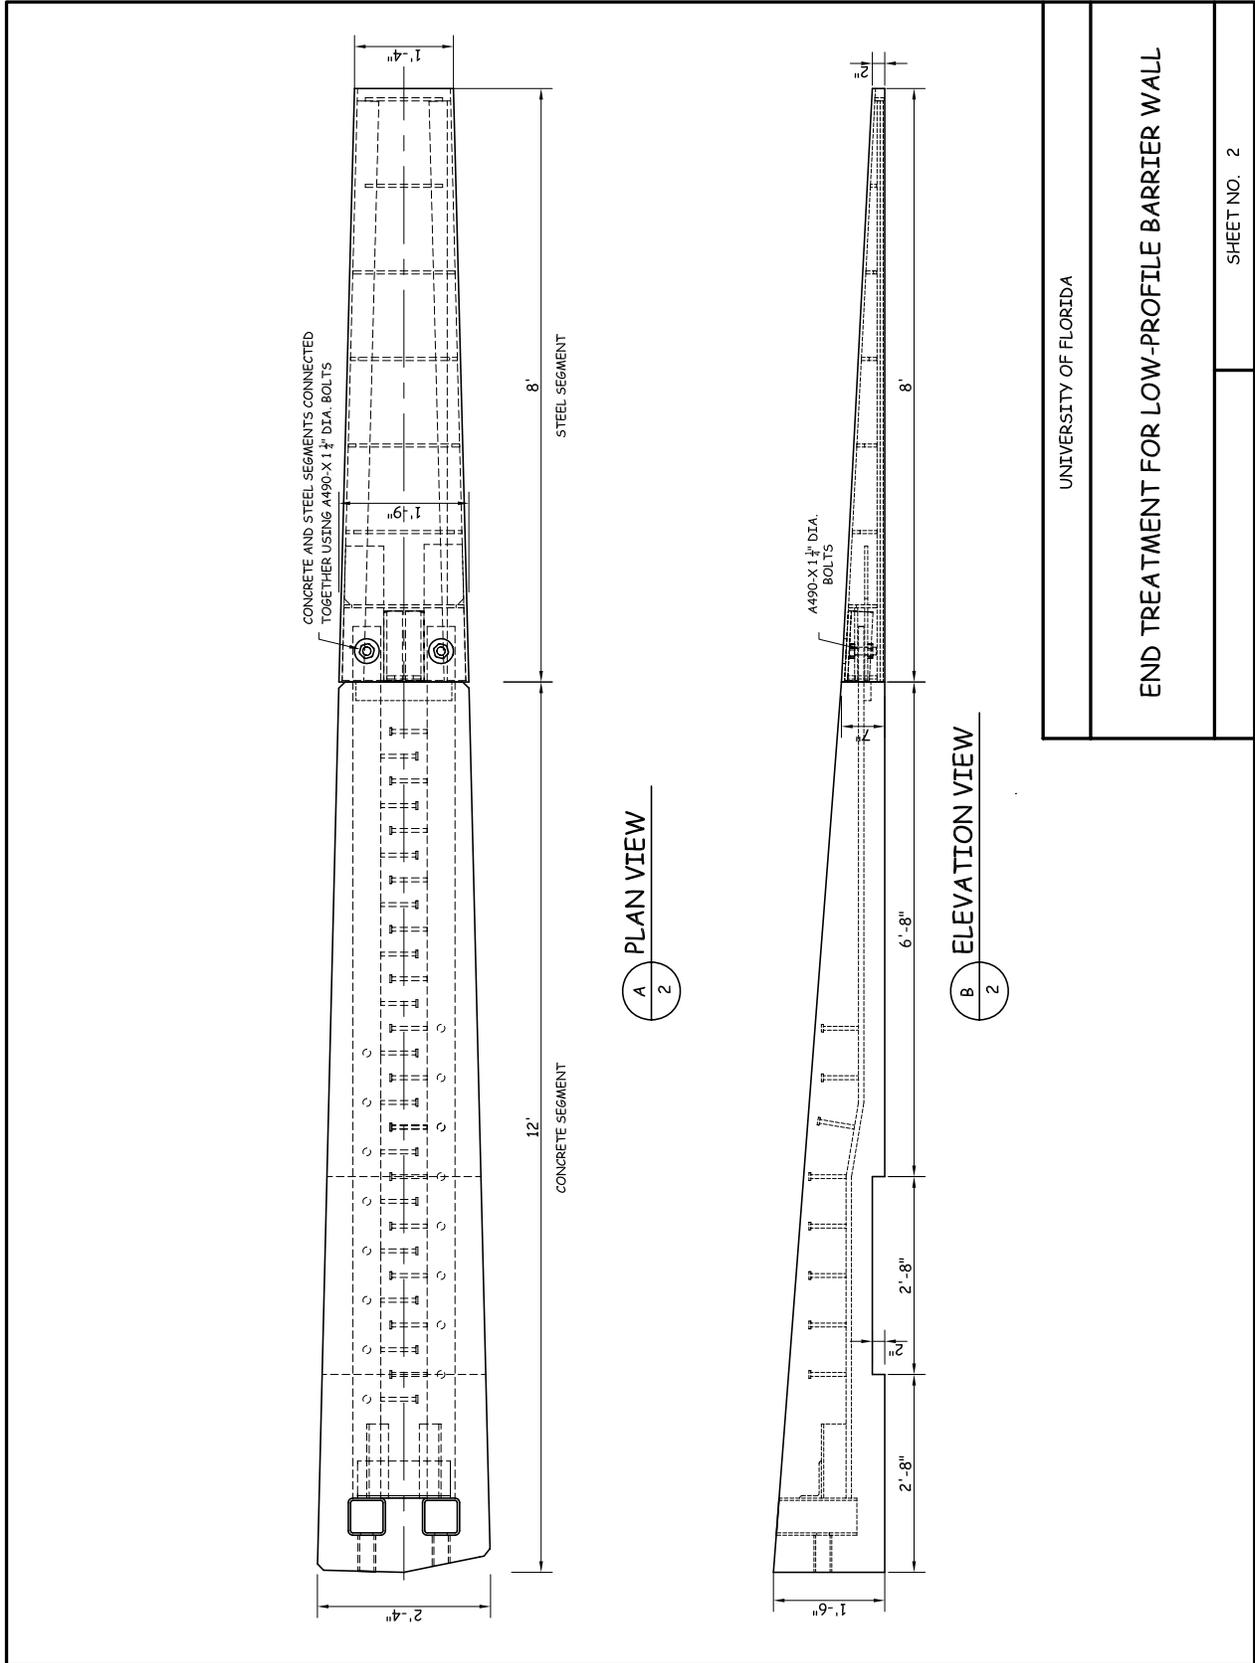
Drawings of Florida Concrete Curb End Treatment (2 of 14)
